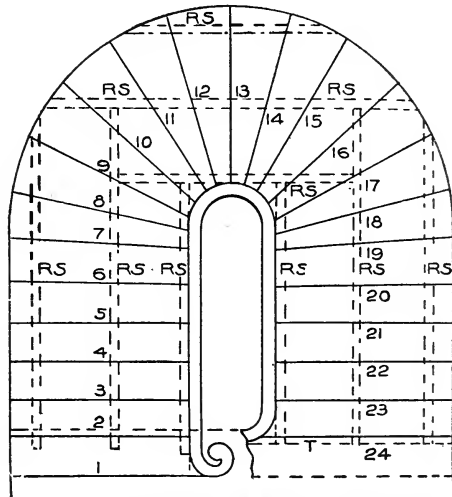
Plan Showing One Method of Constructing Carriage and Trimming Winding Stair.
